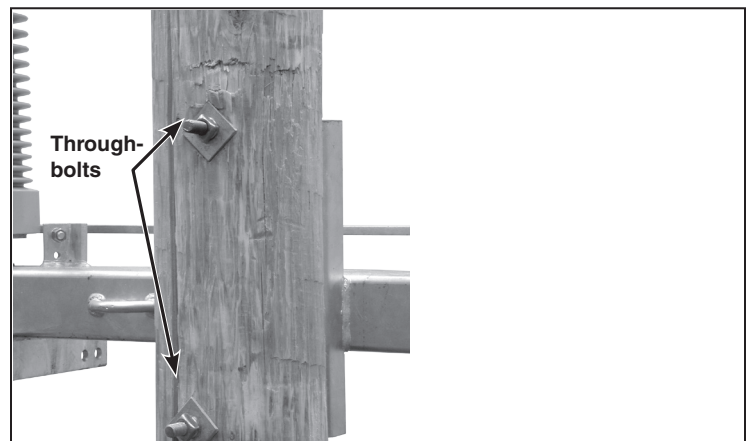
Engage the switch mounting bracket with the keyhole slot and mounting notch, and tighten the bolts.
